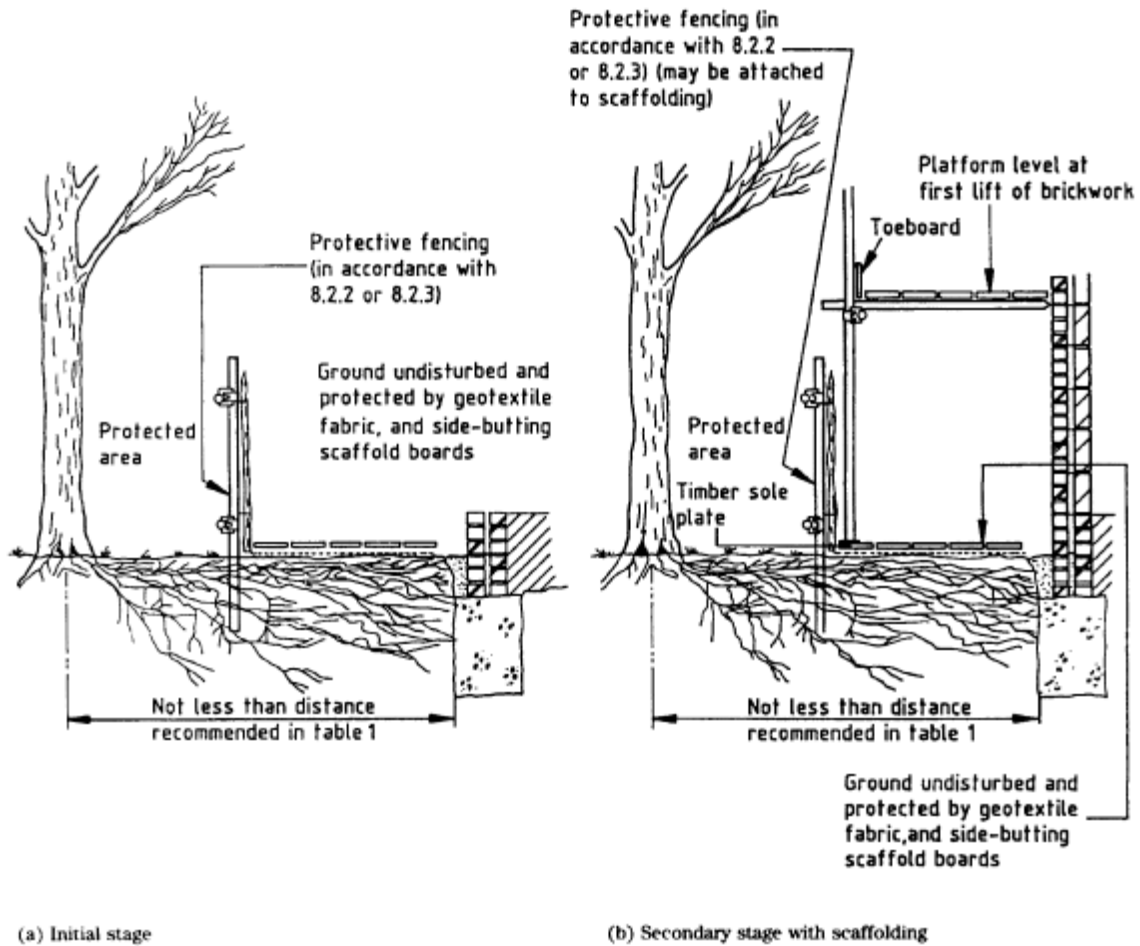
Adapted Barrier Incorporating Temporary Ground Protection
